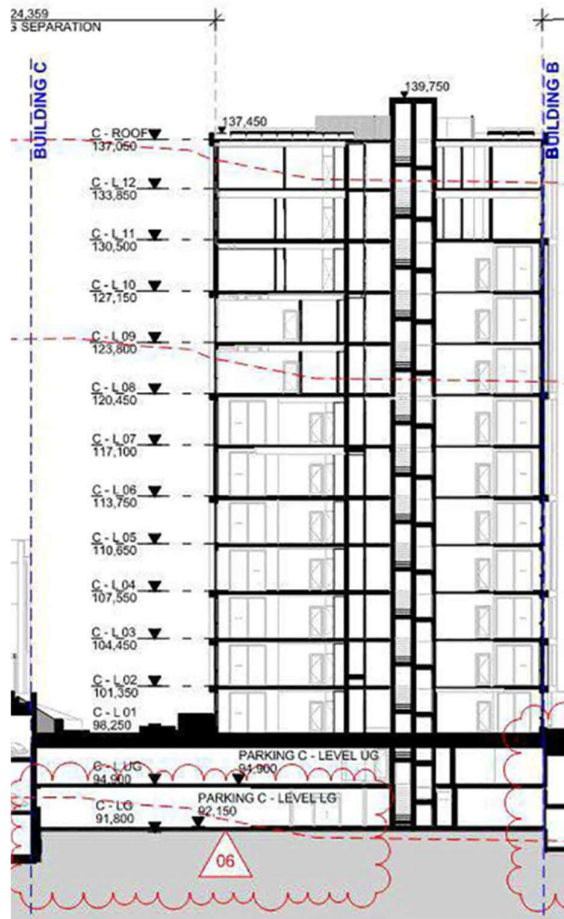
Approved and Proposed E-W Section of Building C (2 of 5)
